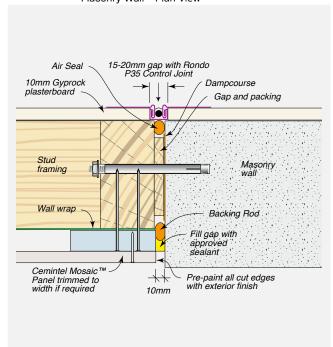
Junction of Mosaic Cladding System with Offset Masonry Wall – Plan View
